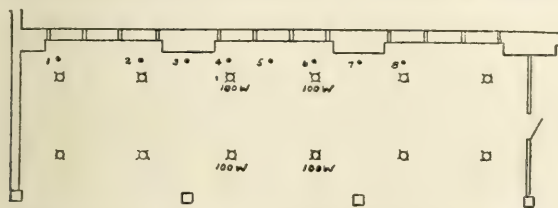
Plan showing test stations along west wall, north wing, on third floor.
